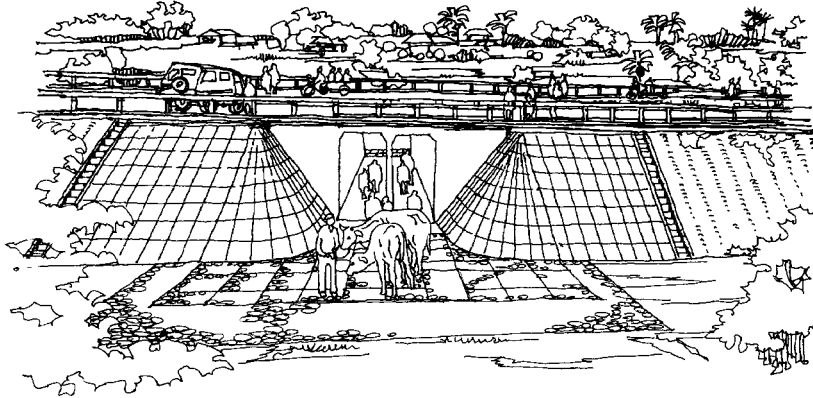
Example of Box Culvert Used as Crossing Facility
